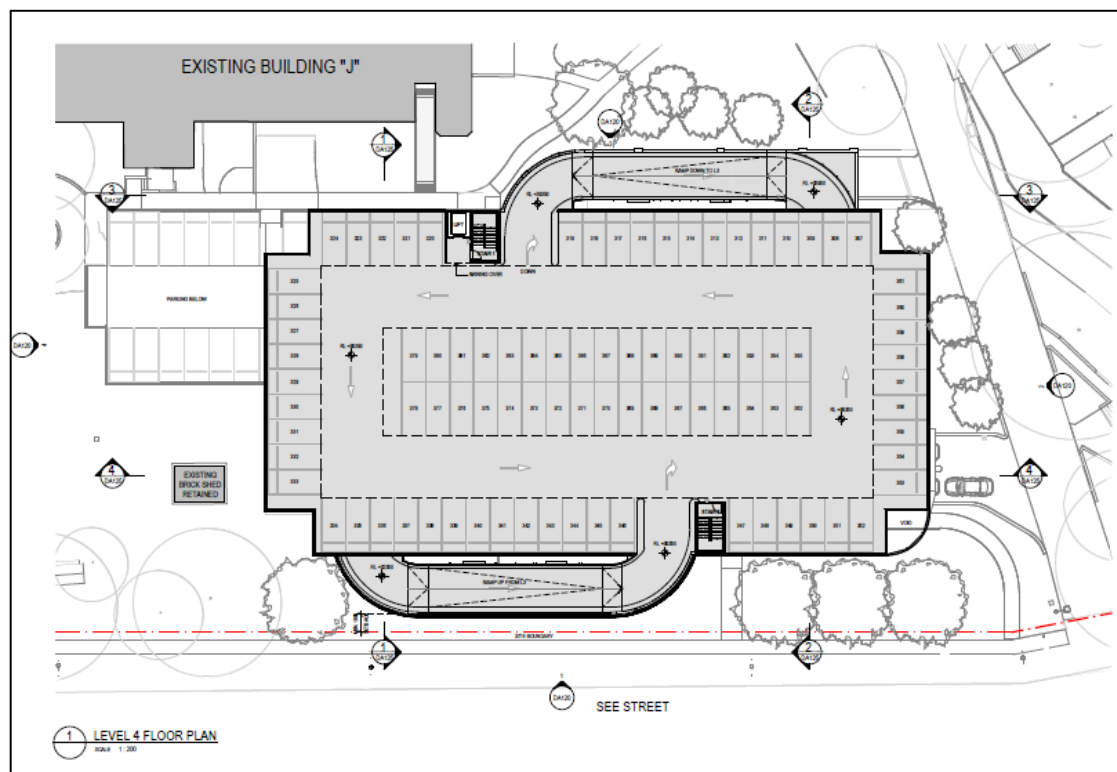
Level 4 floor plan of proposed multistorey carpark (Source: Hansen Yuncken, 2021c: DA104, Revision A).
